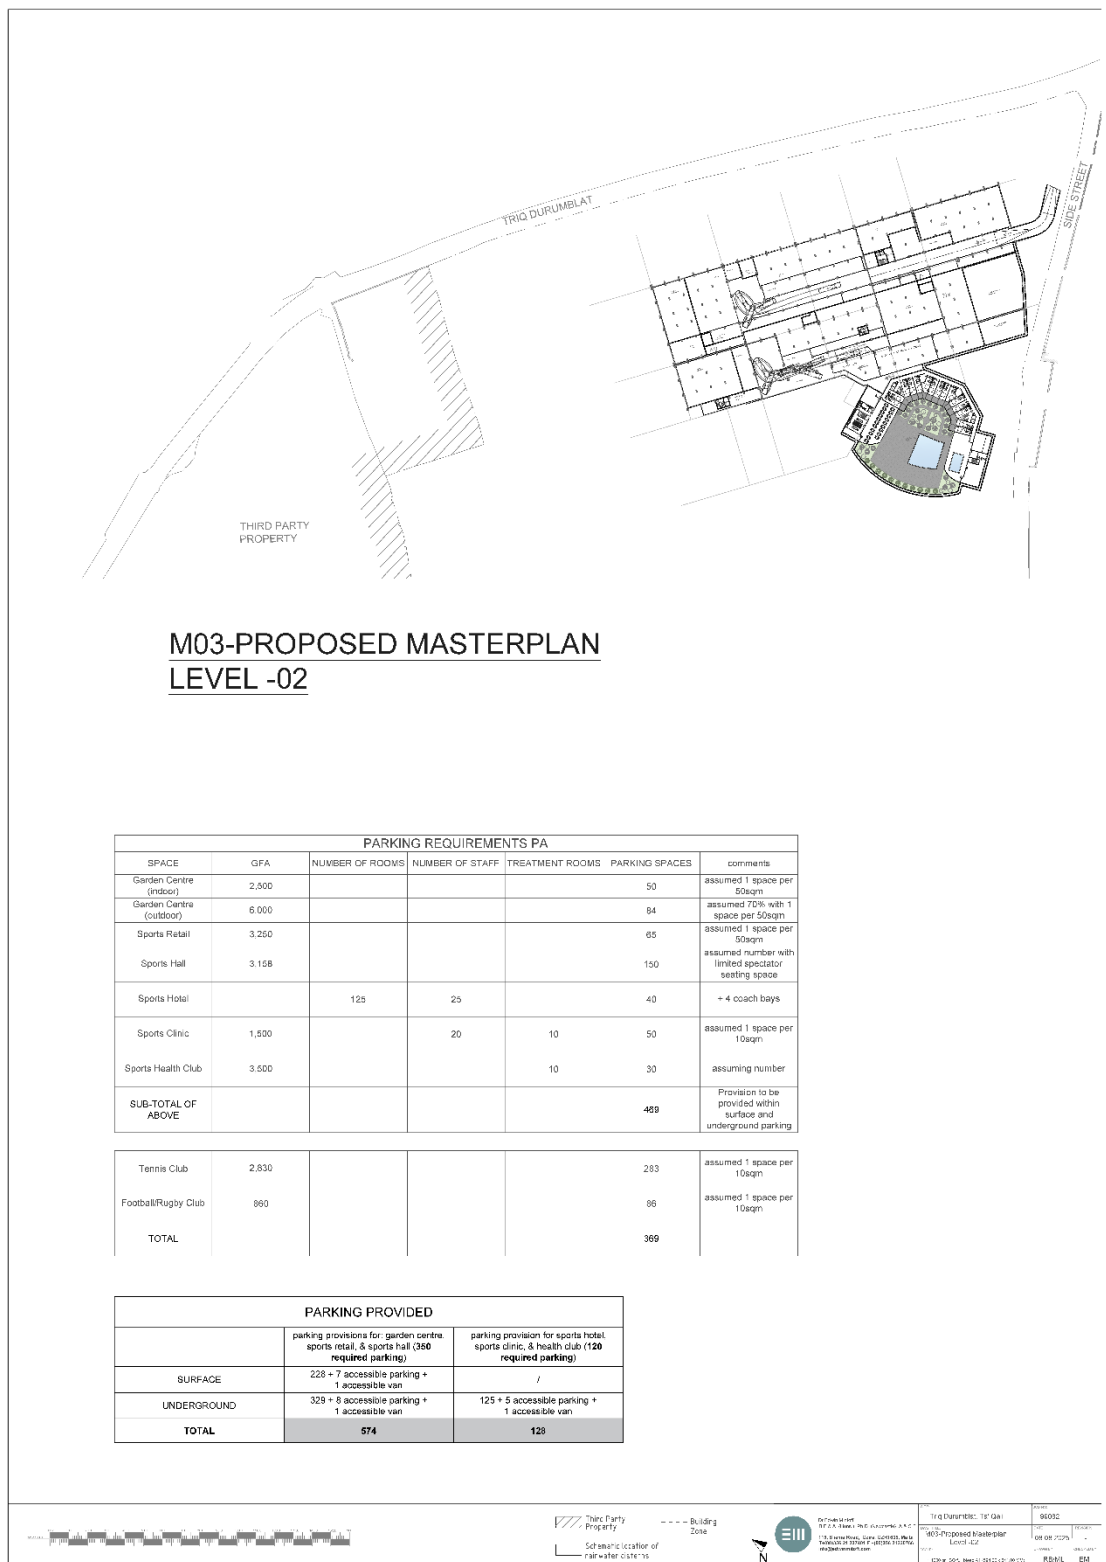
PROPOSED MASTERPLAN LEVEL -2
